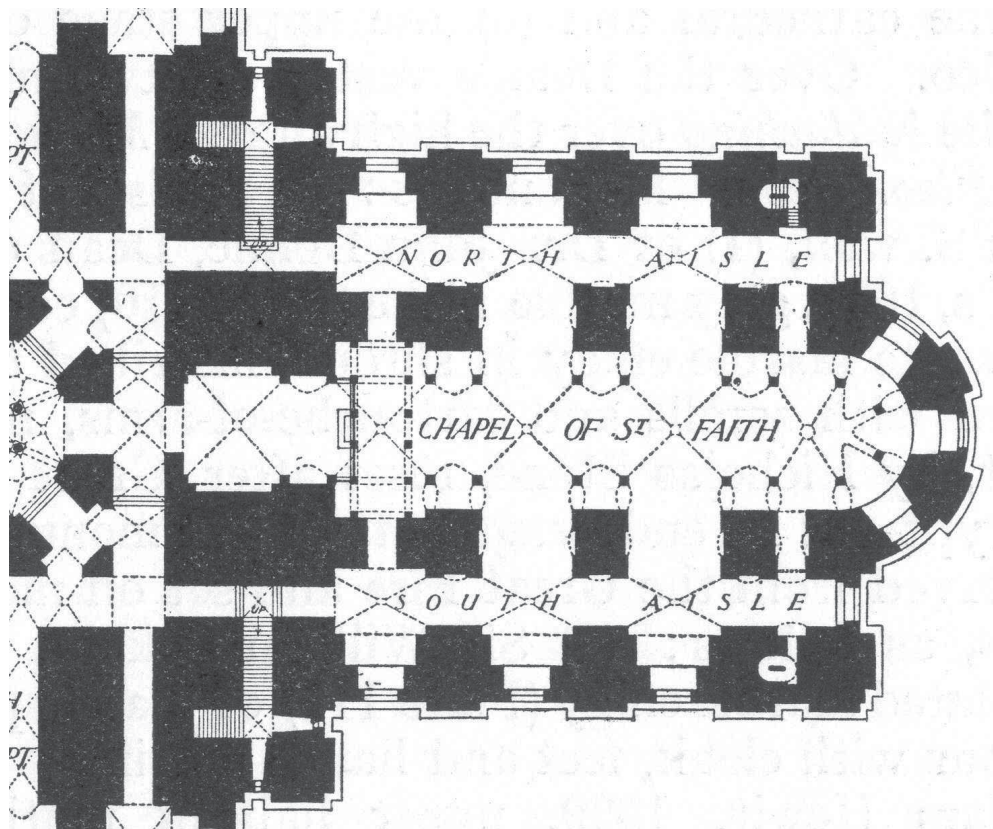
Plan of the east end of the cathedral at crypt level in 1929, showing the pre-War arrangement and general character (RCHM 1929)
